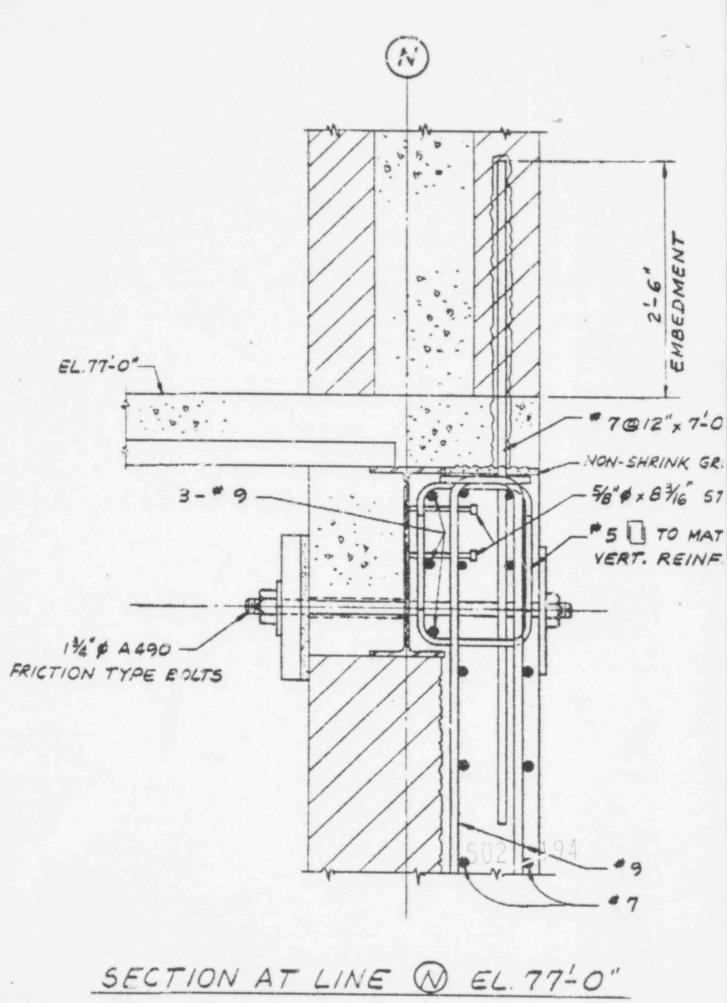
DETAIL AT COLUMN LINES (N) AND 46 BETWEEN EL 65'0' AND EL 77'0"
